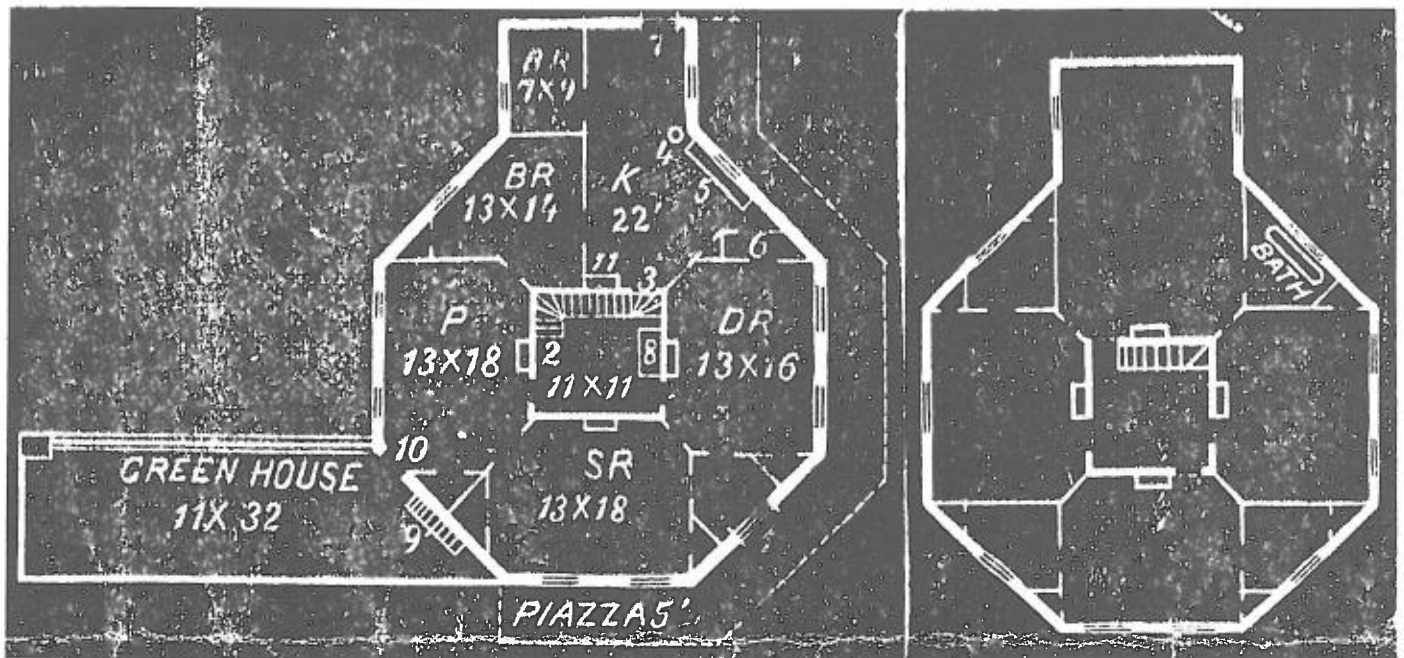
Floor plans for Chamberlain's proposed octagon house, *Moore's Rural New Yorker*, May 10, 1873 (MHPC).
